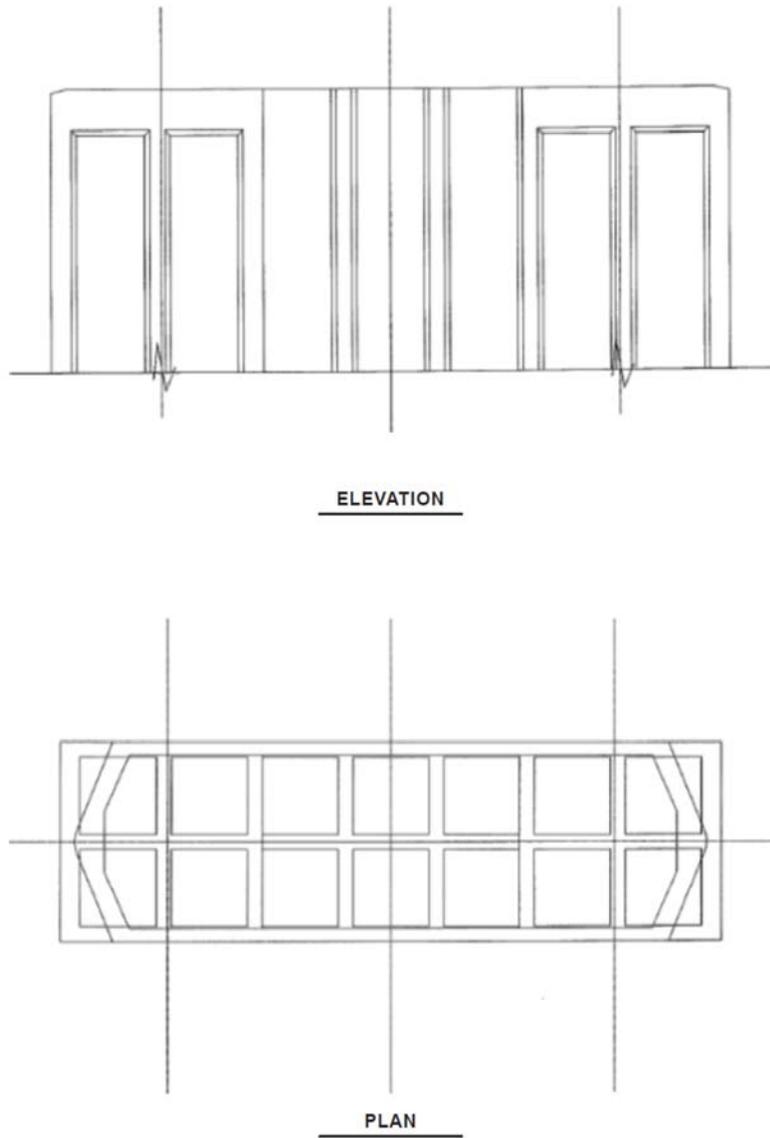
Pier E3 Schematic. Elevation view of the pier cap material over the inner cells of the pier, and the walls that are to be removed. An access platform is to be placed over them to support dismantling equipment.
